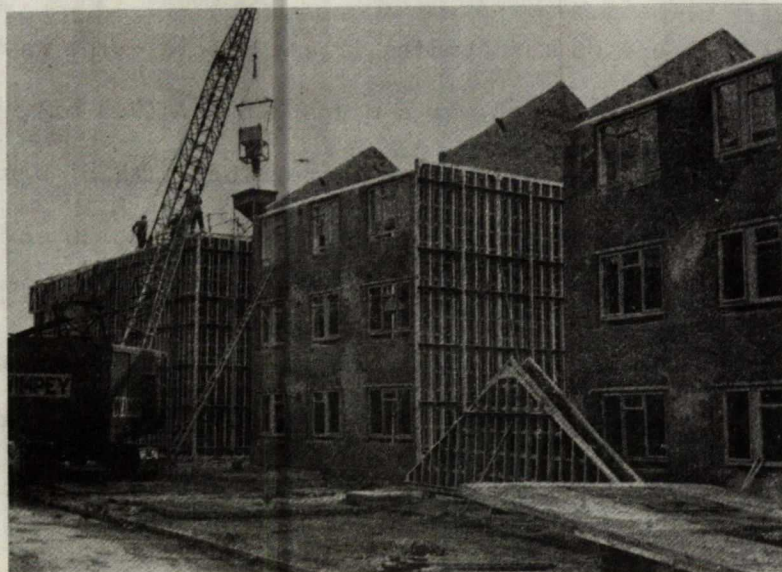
Three-storey dwellings under construction with no-fines concrete.
